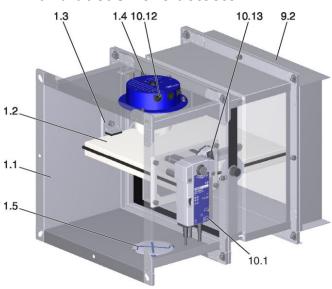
FK-EU with spring return actuator and duct smoke detector
